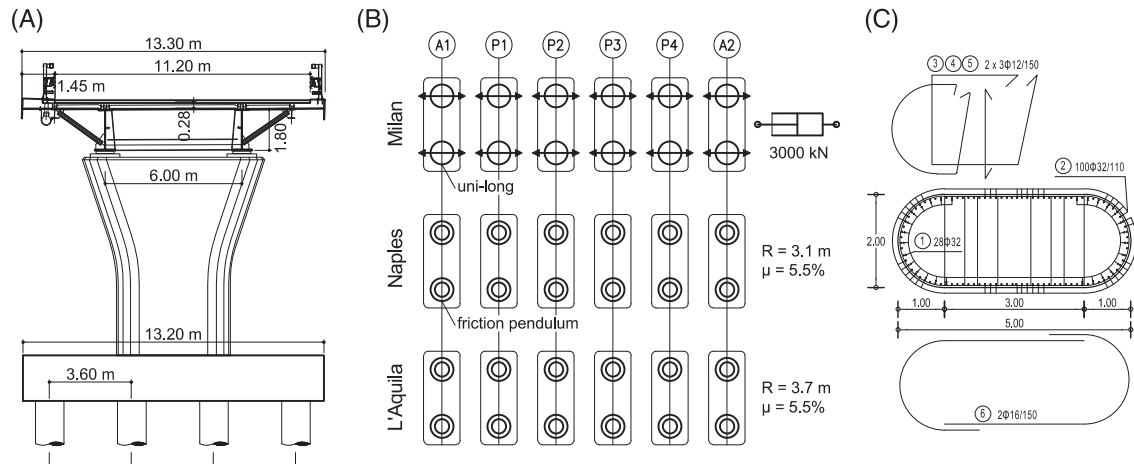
Shallow viaduct: deck cross-section (A), bearings layout (B) and a pier P1 cross-section with reinforcement layout (L'Aquila) (C). For DCSS, the reported friction coefficient is that associated with the highest nominal pressure (see Section 4.3) and radius is the equivalent single-curvature one.
